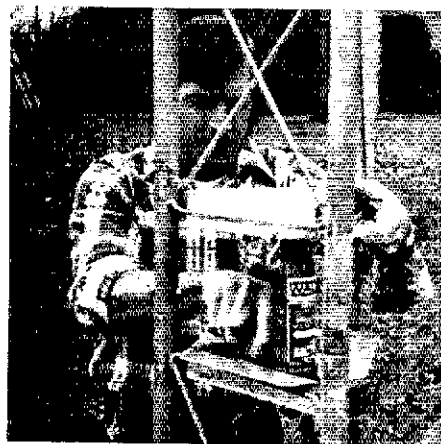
Hydraulic jack being placed between upper and lower bearing plates.
